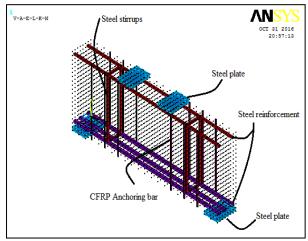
CFRP bars, Steel plate and reinforcement meshing
